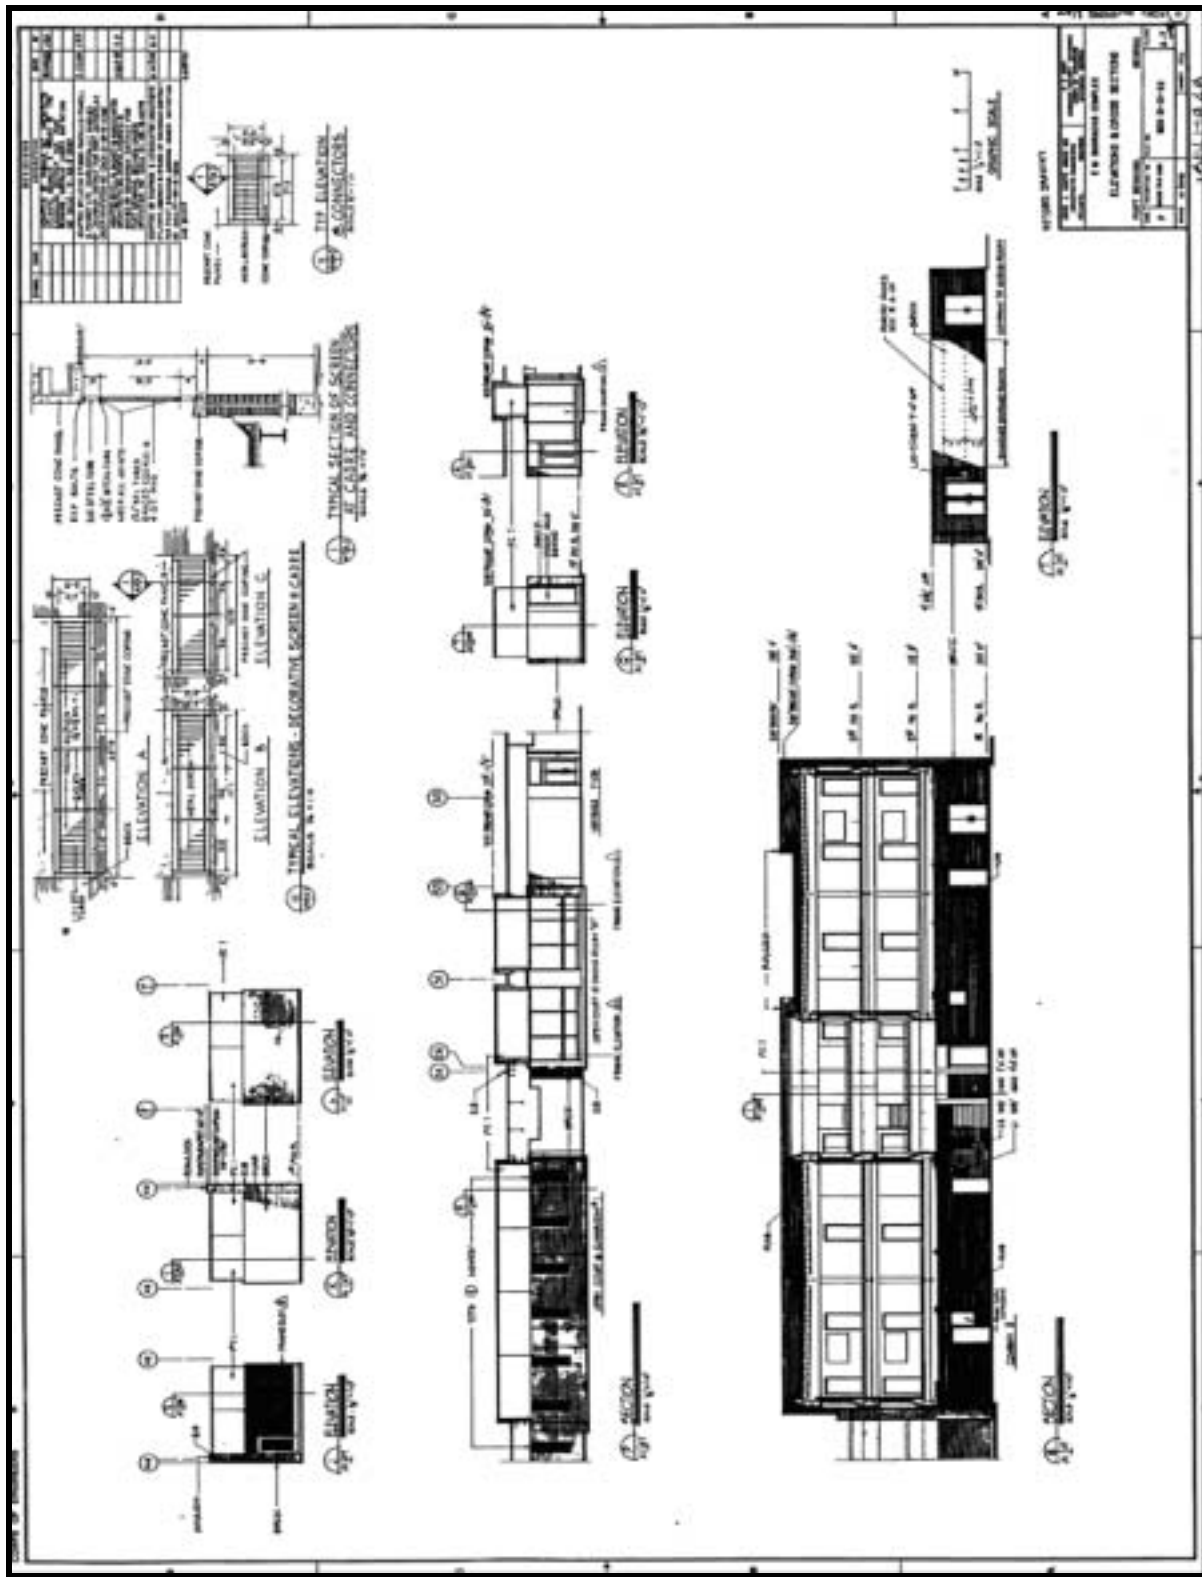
Starship barracks, elevations and cross sections (ca. 1974, revised 1986) (Engineering, Ft. Benning).
